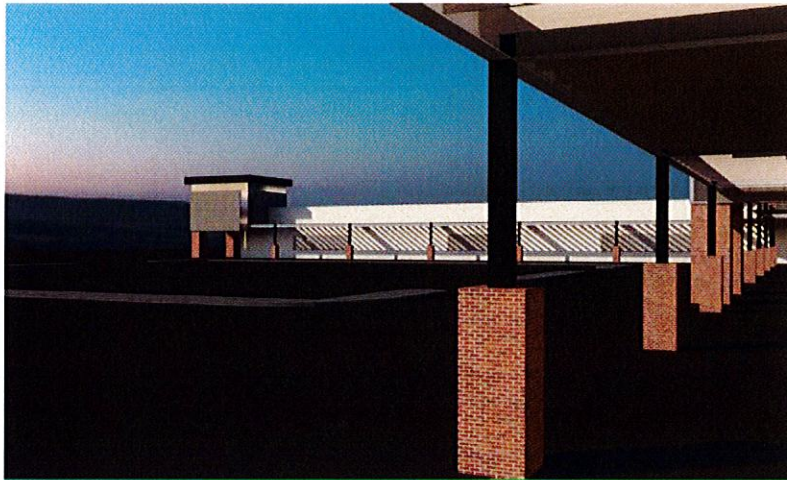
Proposed Rendering of Façade Improvements – Looking West.
